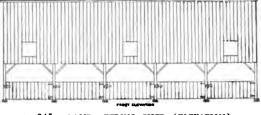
LAMB FEEDING SHED (ELEVATION).
